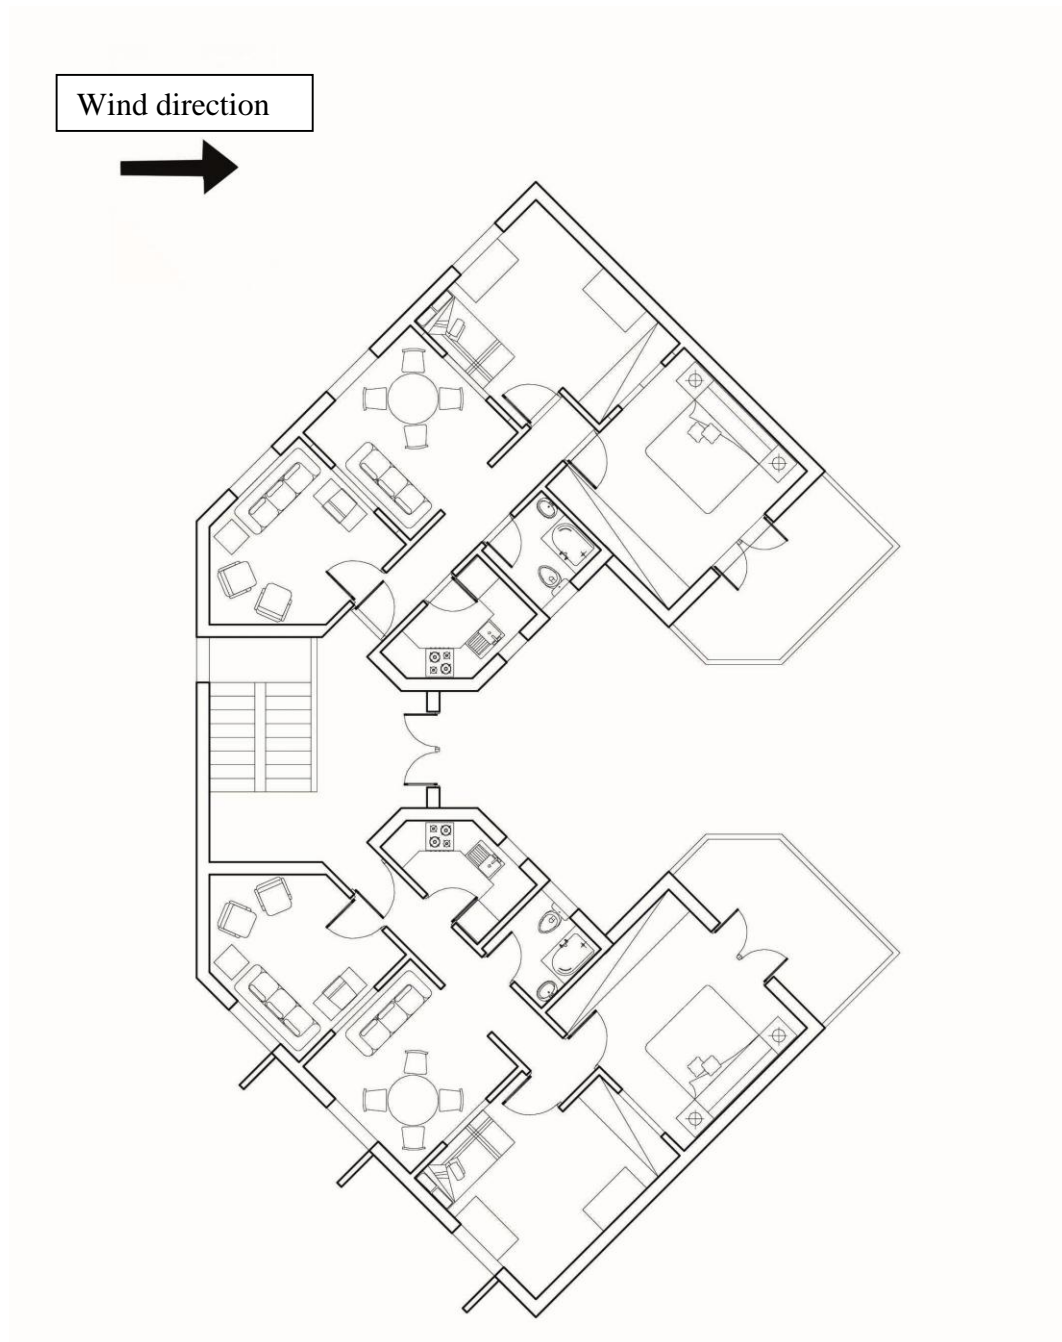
Plan for a building with apartments 63 m² in area, this type of housing was designed for youth.
